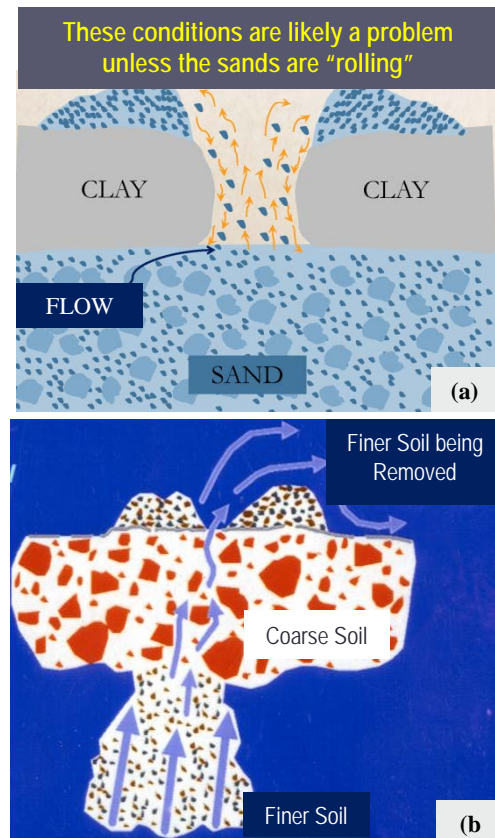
Finer Soil Being Removed through (a) a Defect (crack, blowout, penetration) in a Confining Layer, or (b) a Coarser Overlying Layer can Progress [9]
